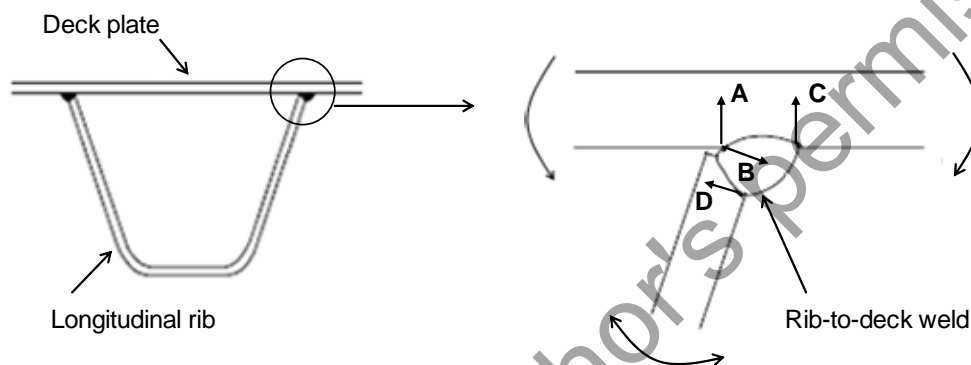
Fatigue cracks at rib-to-deck joint.
